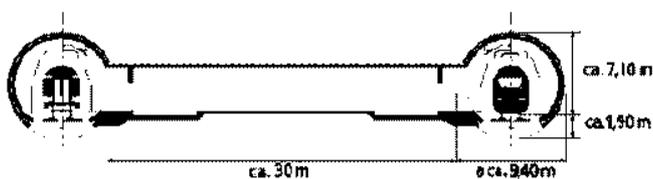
Typical cross section of the two twin tube tunnel in the section of Bodio.
